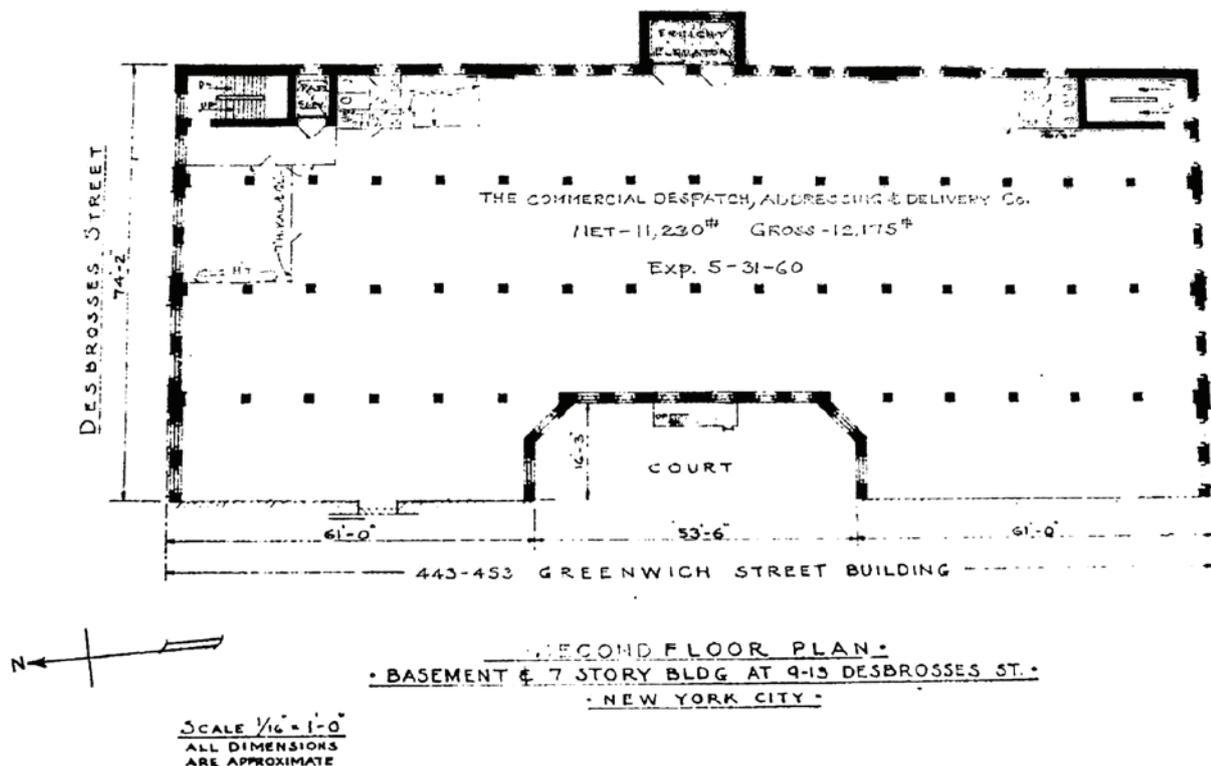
Historical floor plate of the second floor of an industrial building (Source: Trinity Archives)
